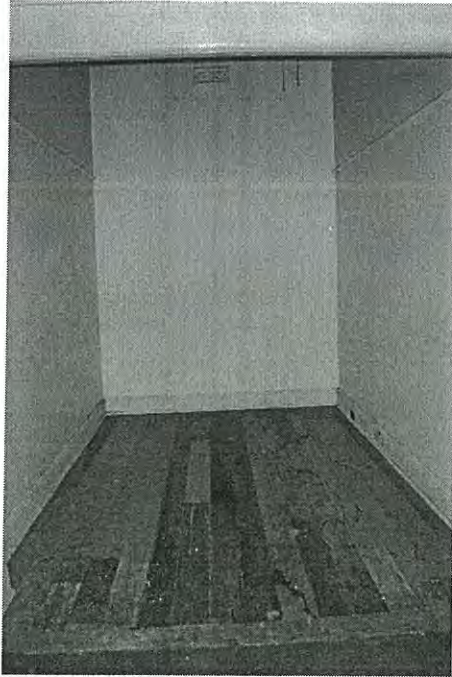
Interior, Booth (space B04). Note recycled timber floor boards, but the replastered walls and plaster wall vent are original.
